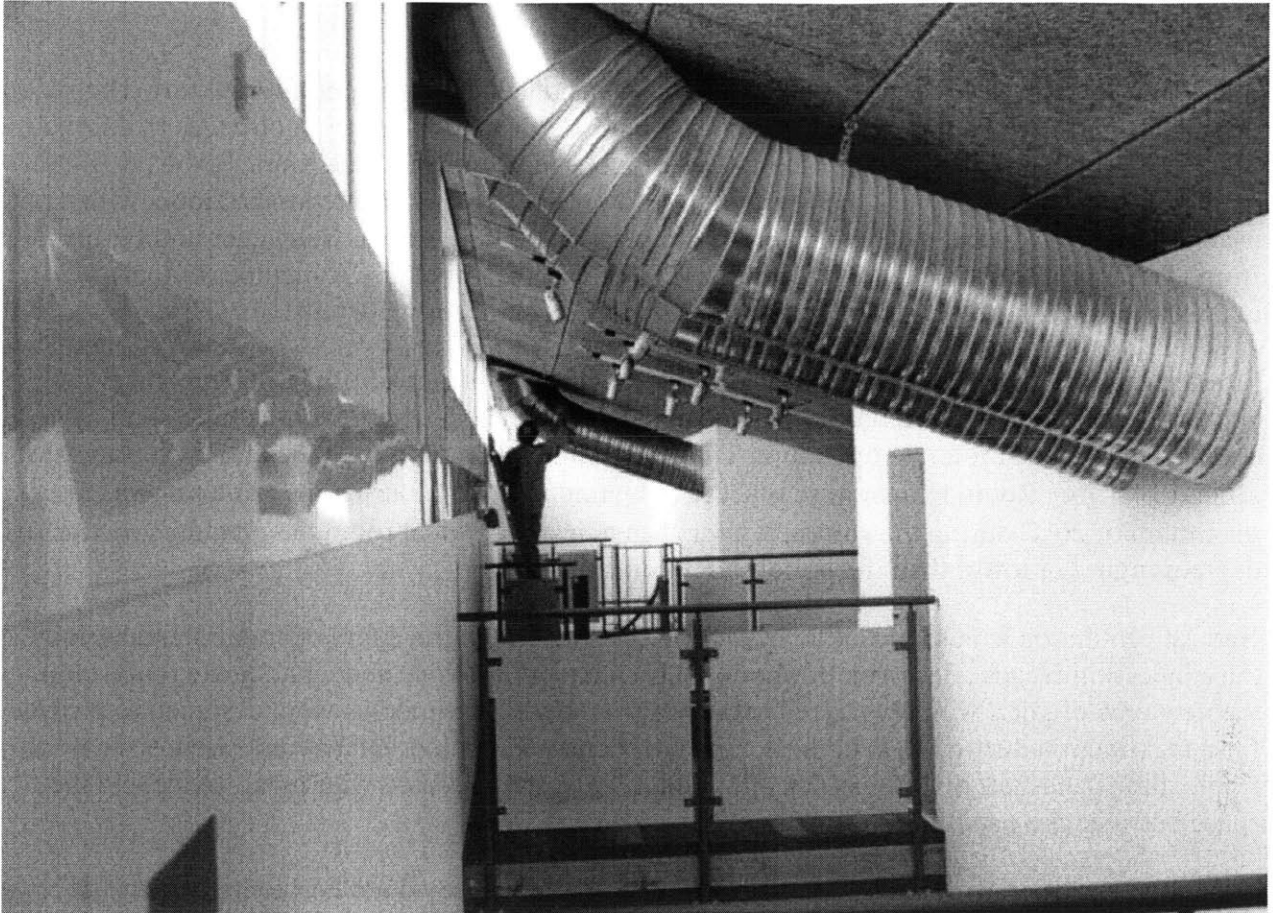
Ventilation ductwork to the roof. Each duct feeds into an individual classroom. Fans in the roof ventilation box assist the process.
